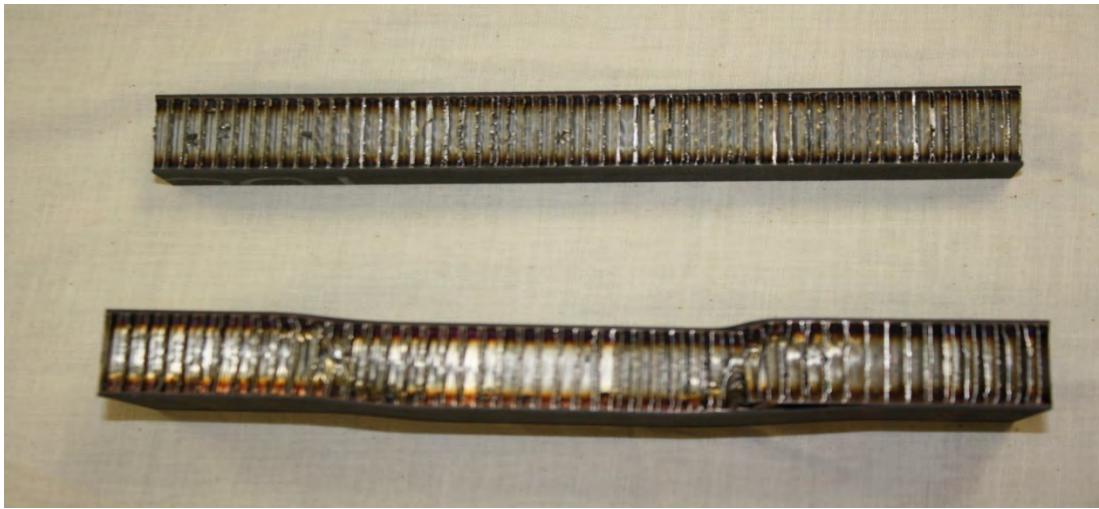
Beam Flexure Test Specimens Pre- and Post- Testing
